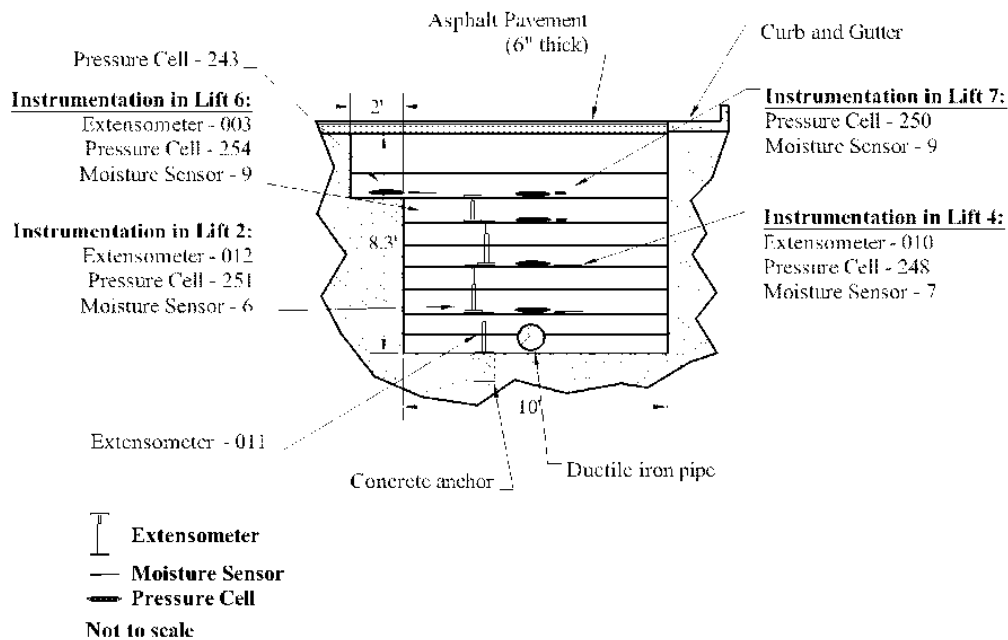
Cross-section of Trench CI showing the locations of instrumentation
